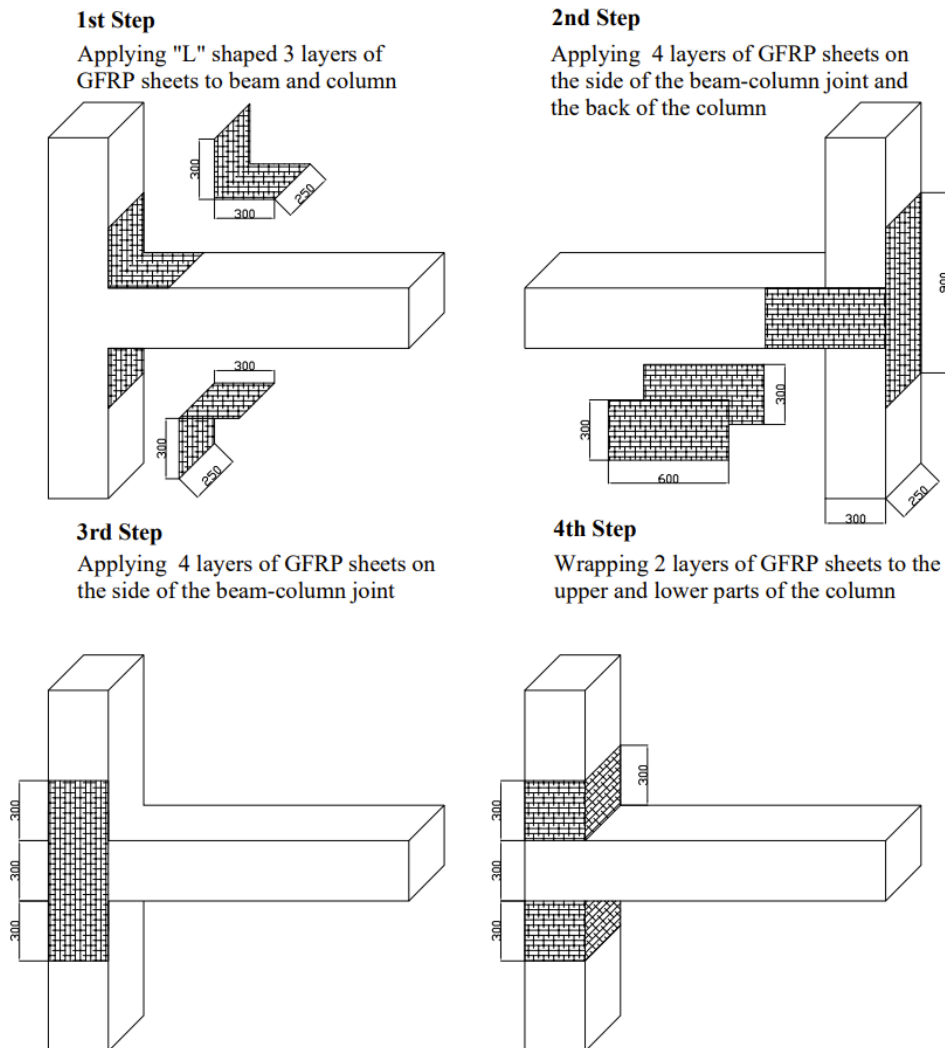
The application plan for the EB-FRP method (units are mm).
